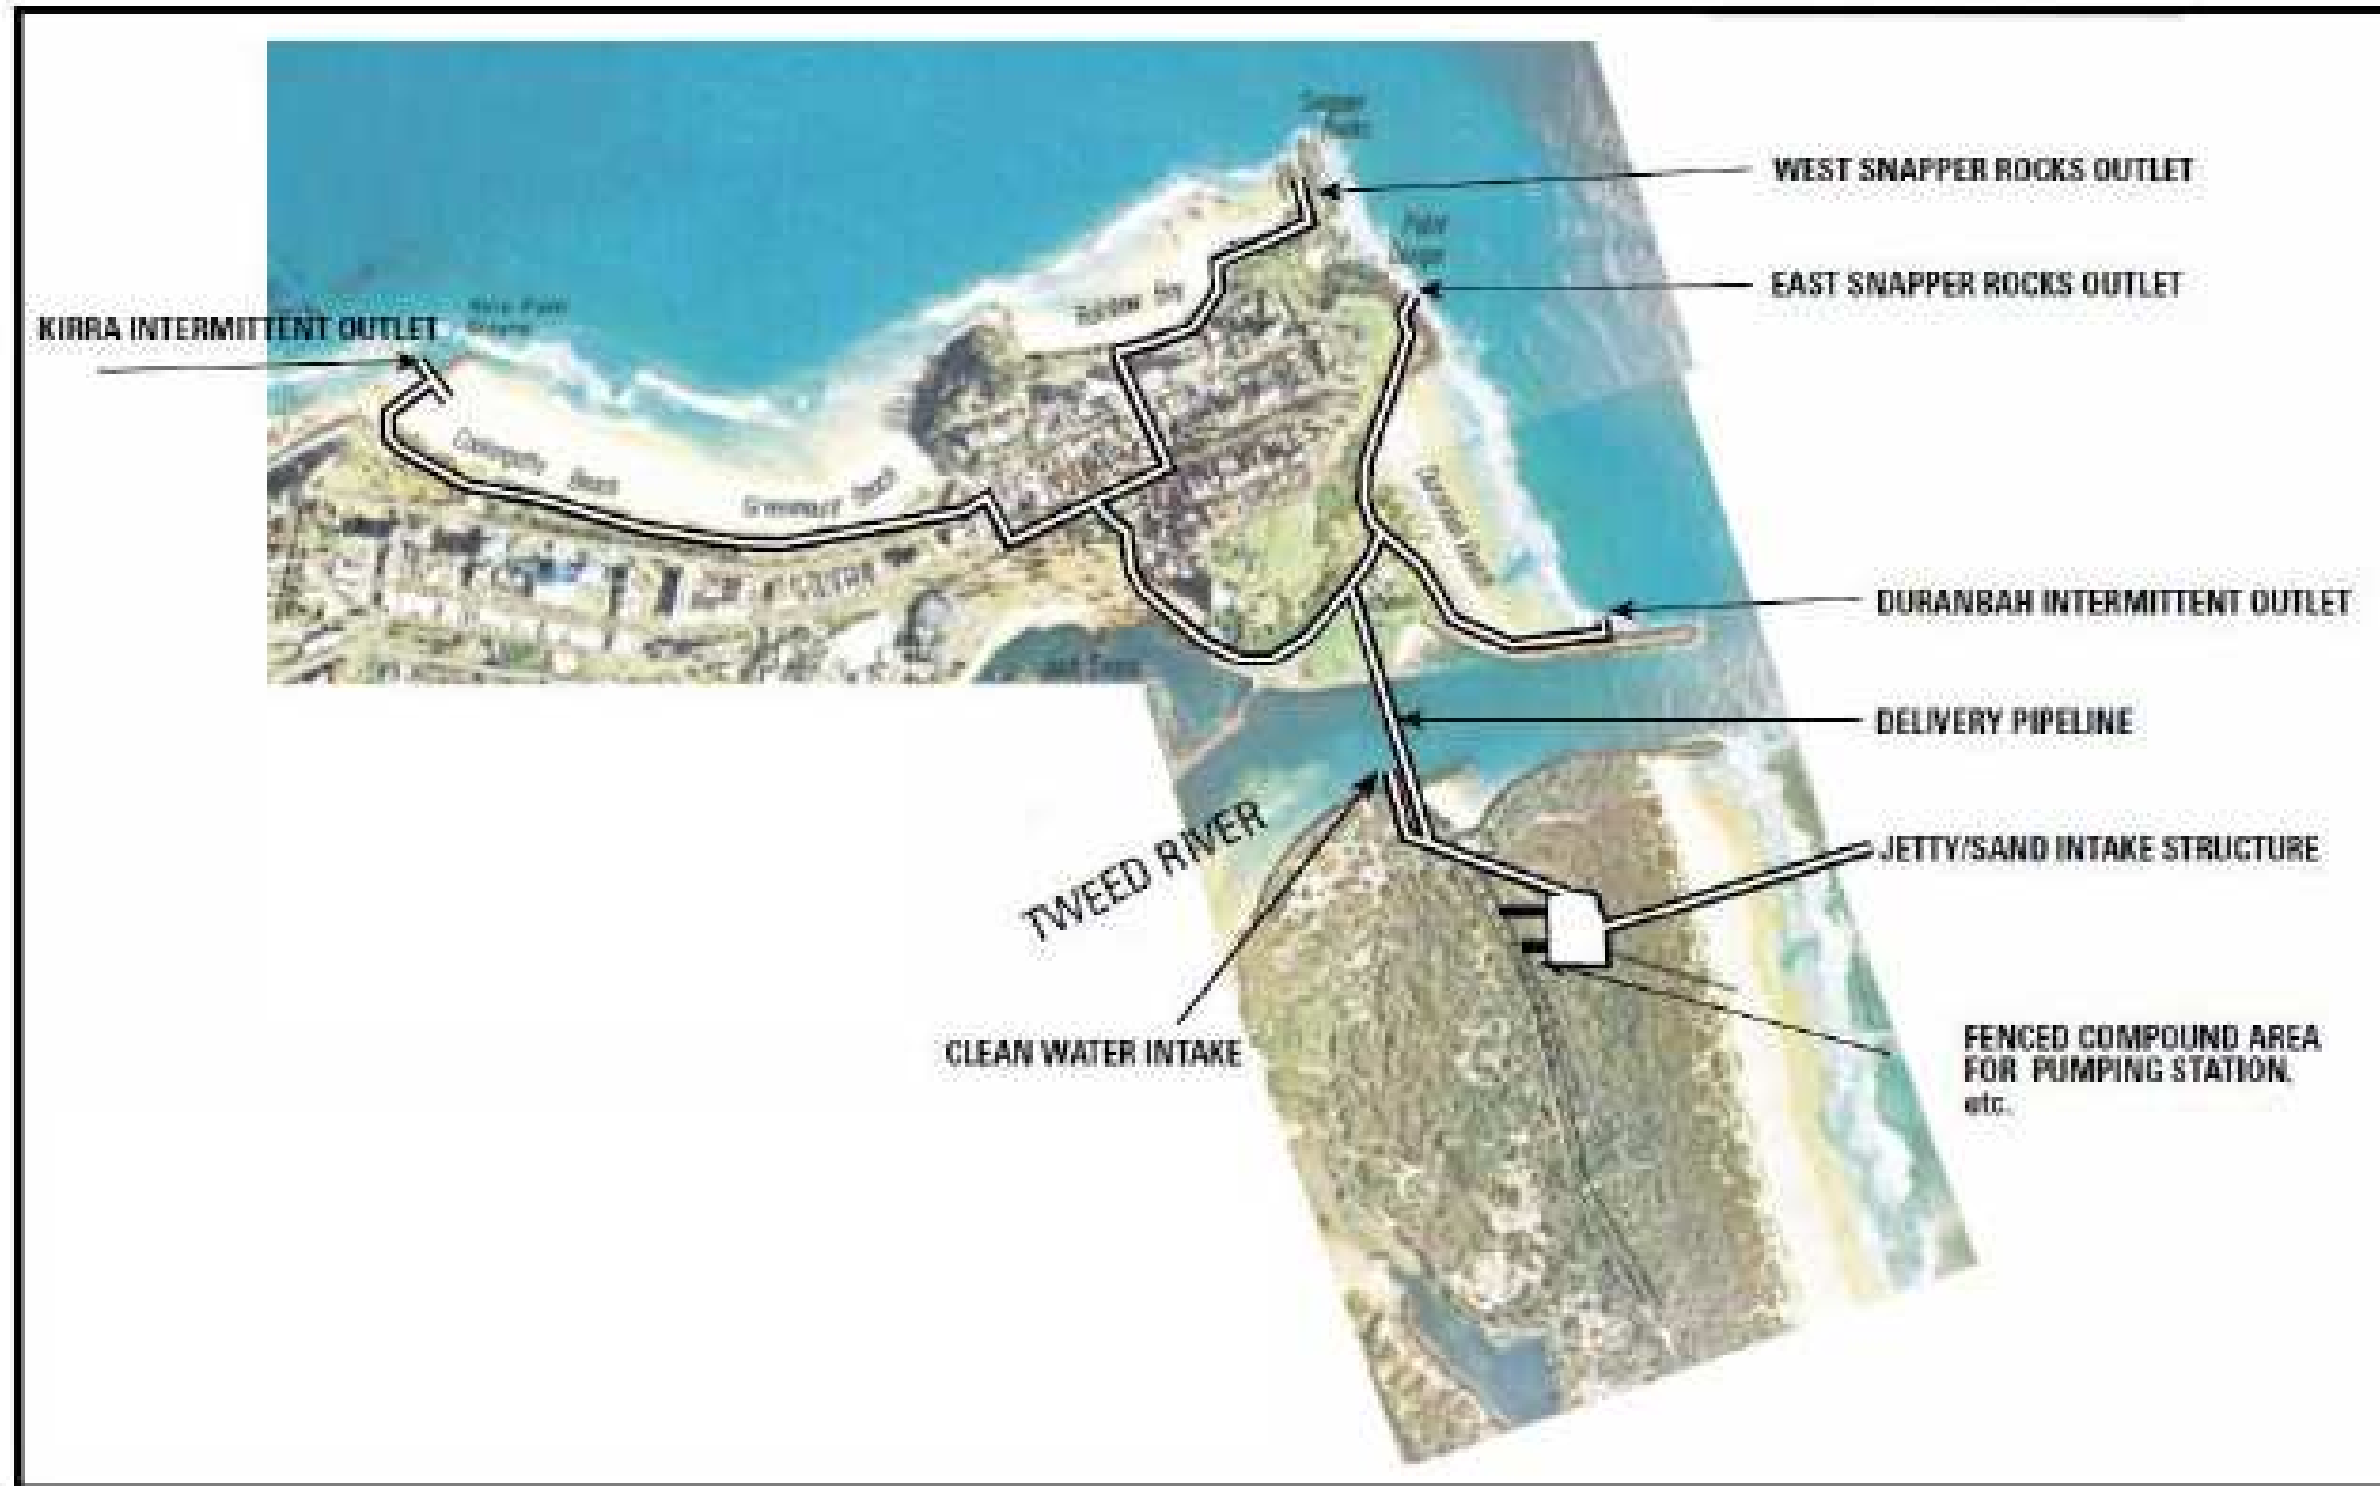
Sand Bypassing Jetty and Discharge Pipeline Layout (Acworth and Lawson, 2011)
